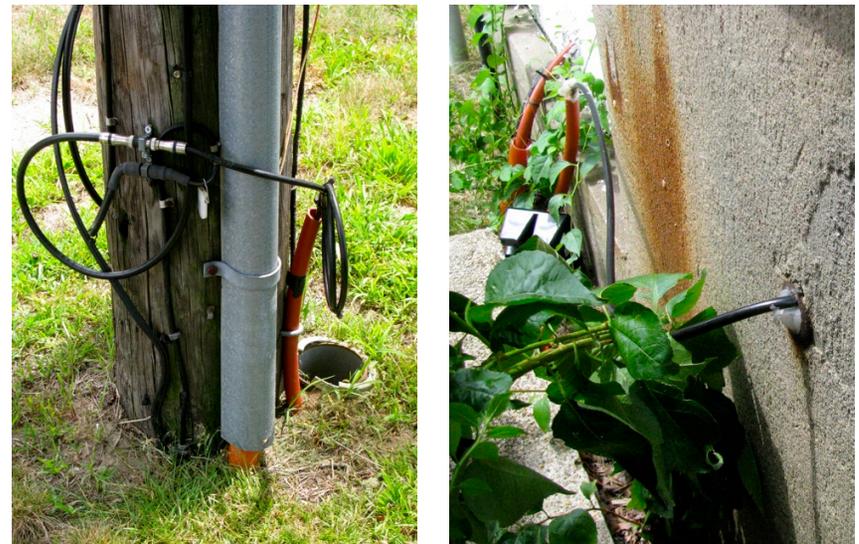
This is an example of Comcast directly buried cable where the cable is enclosed in an outer orange jacket, but does not run through conduits as the electrical services to this site do. The photo on the right shows the building entrance, with the black Comcast cable coming out of the orange jacket, and then entering the foundation wall.
